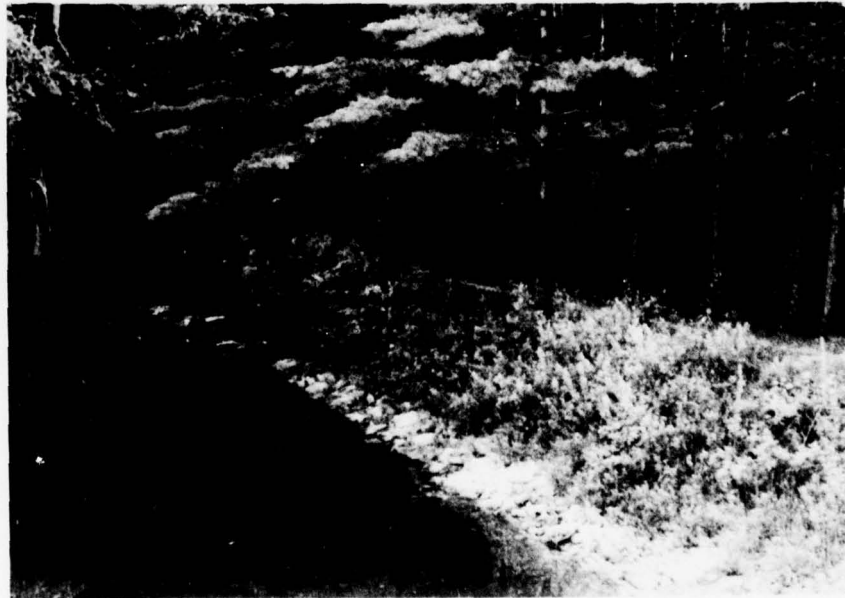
EMBANKMENT UPSTREAM SLOPE
